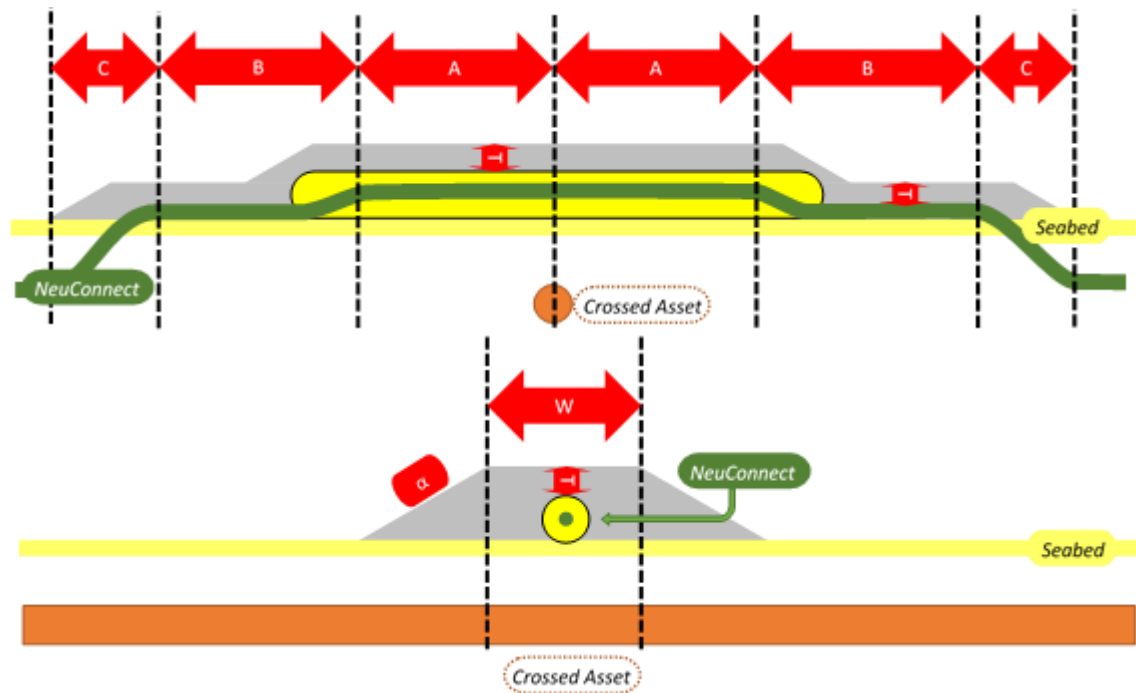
Definition of Proposed Dimensions Type C Crossing
